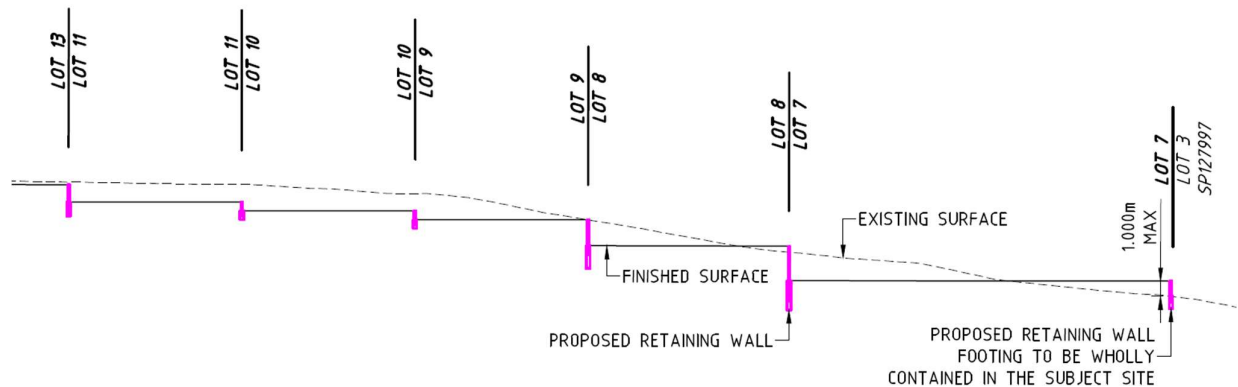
Section C of Civil Engineering plans showing stepped retaining
